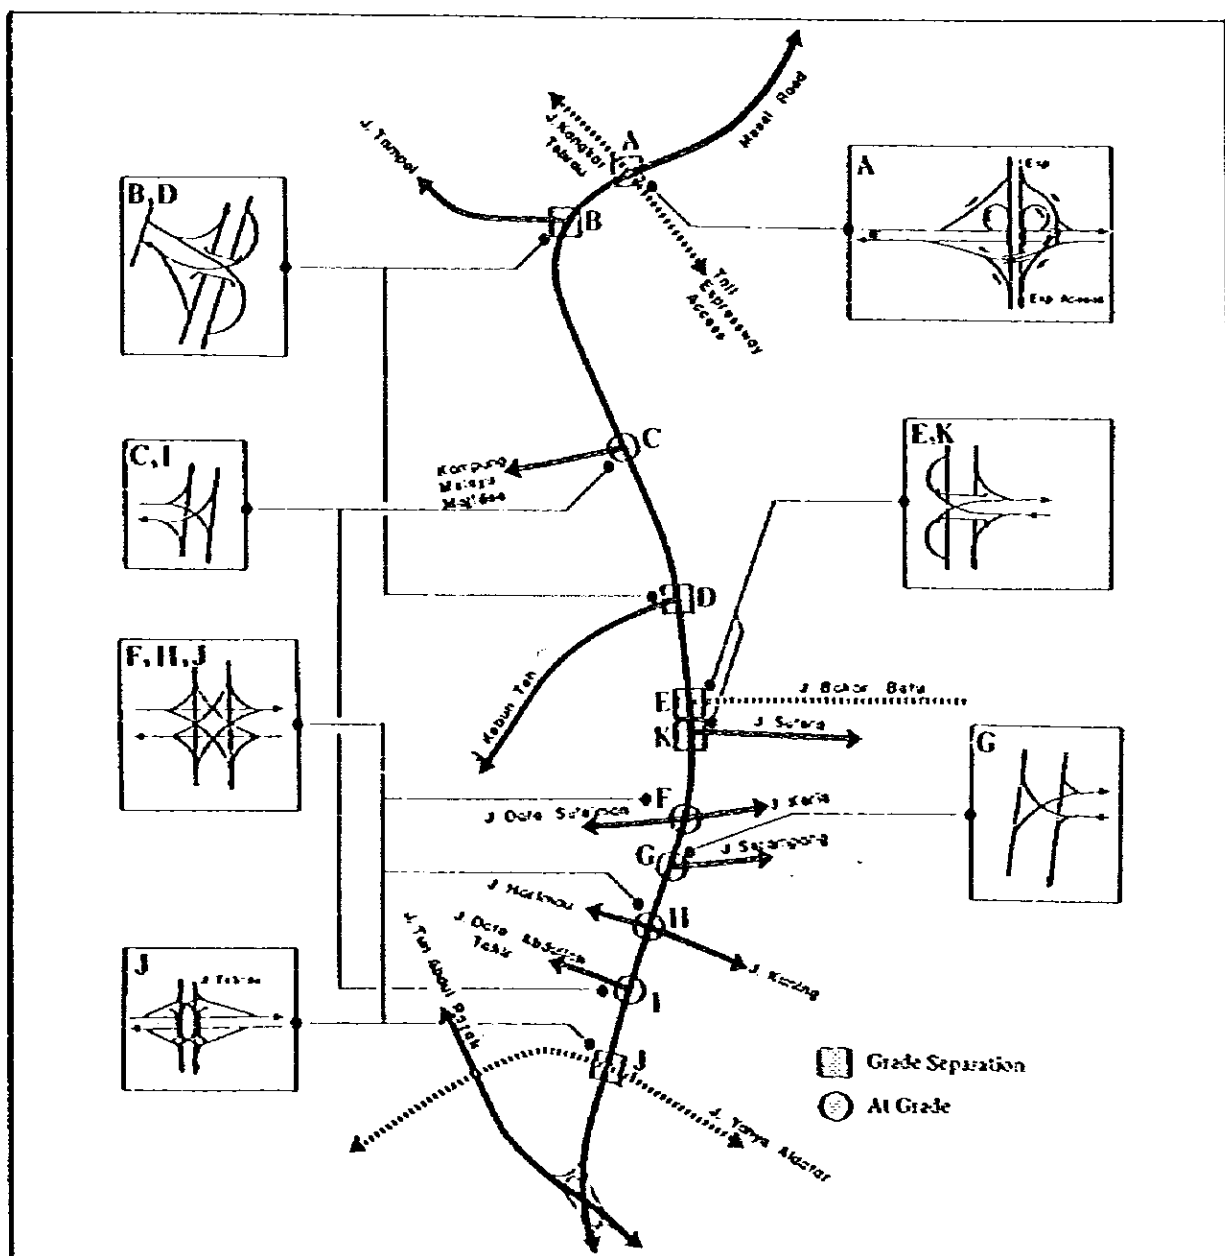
INTERSECTION/INTERCHANGE PLAN ON JALAN TEBRAU
